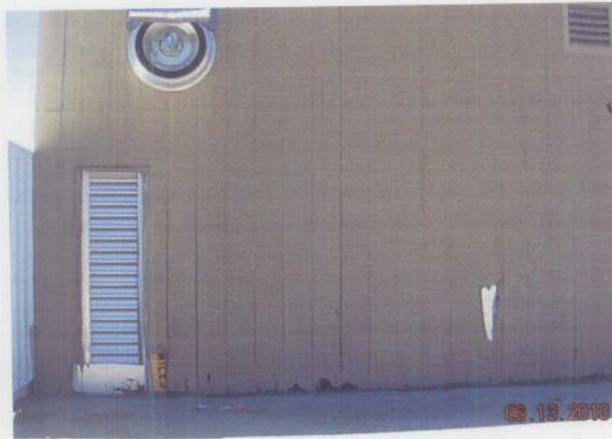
Exterior wall, proposed brine water treatment system at Peddler Hill MS
